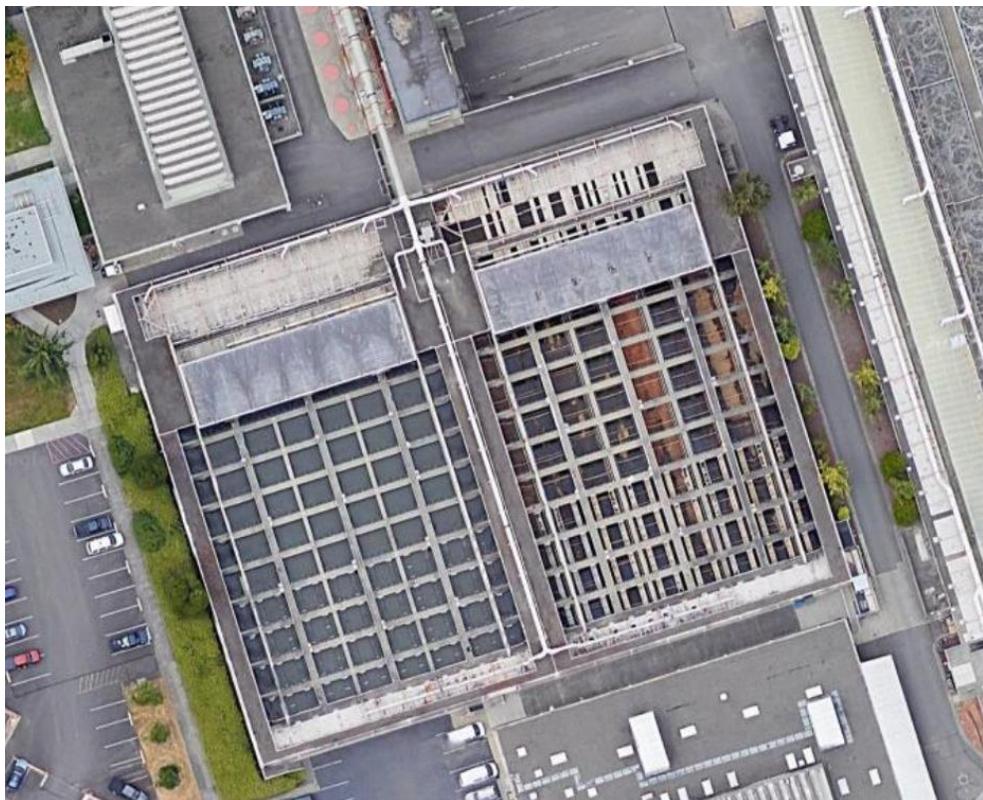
Aerial view of South Plant Treatment Plant Sedimentation Basins after Z-Beam Removal
